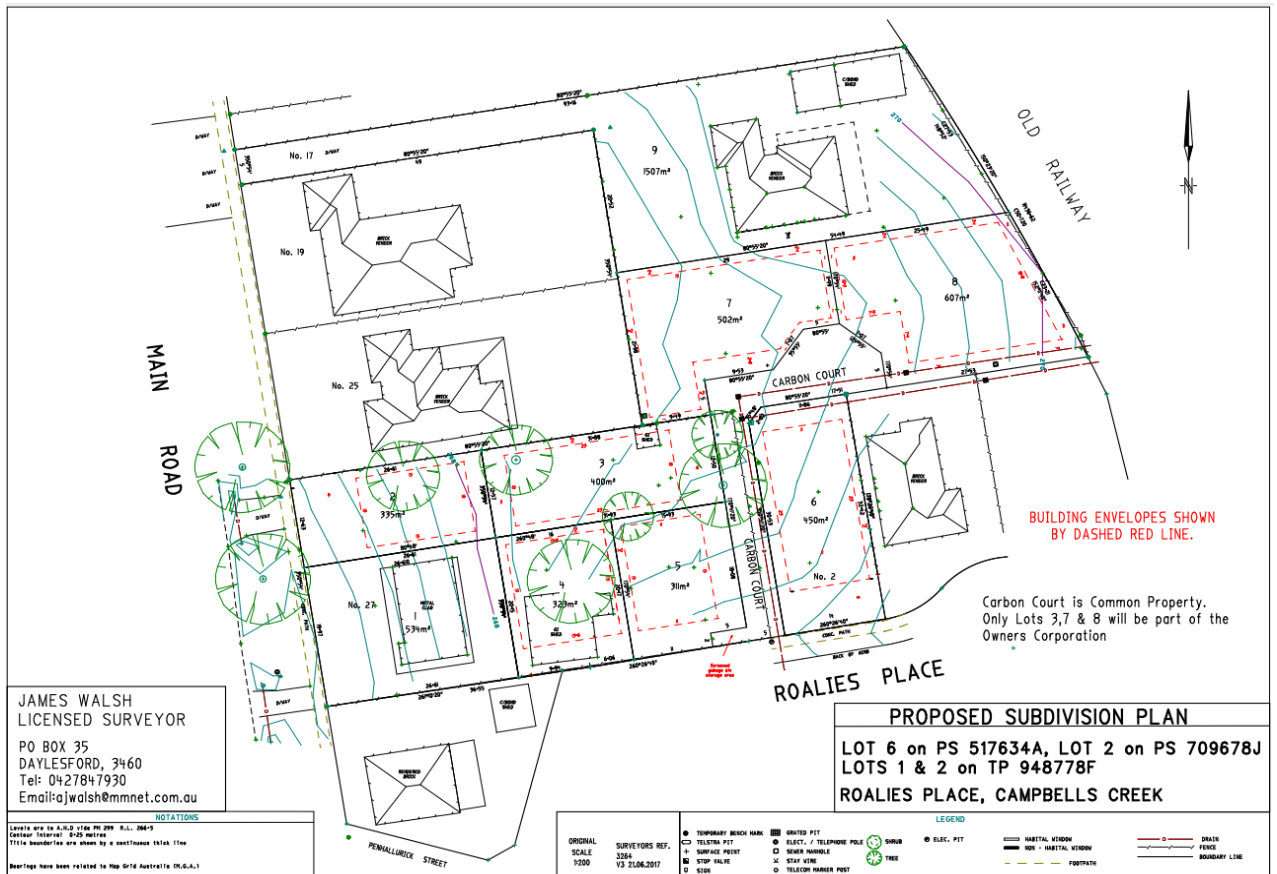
Proposed 9 Lot Re-subdivision. The subject site forms Lot 8 of this subdivision
